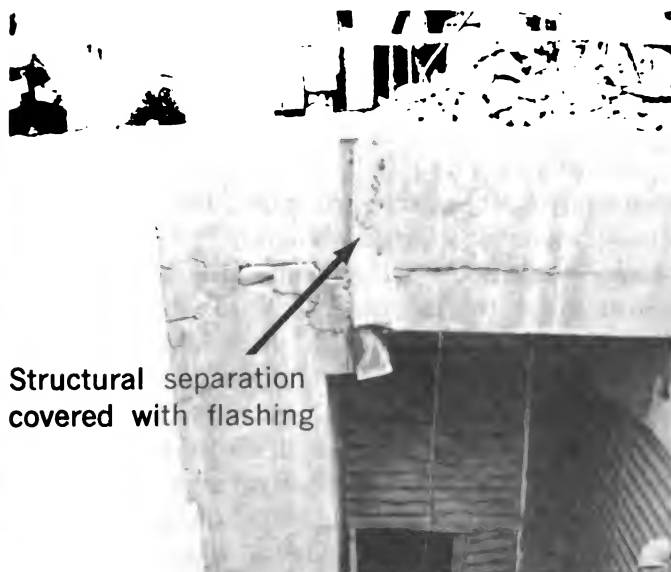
Olive View Hospital, medical treatment and care unit. Areaway pier at northeast wing, showing effects of hammering by first-floor framing through wall separation.
